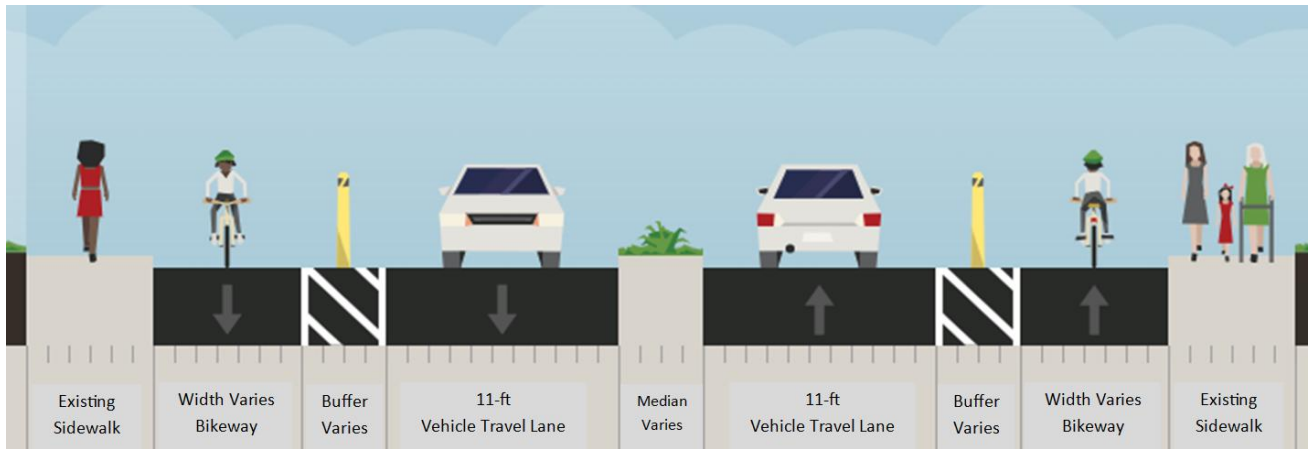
Typical Cross-Section from Miramonte Avenue from Trophy Drive to Marilyn Drive
